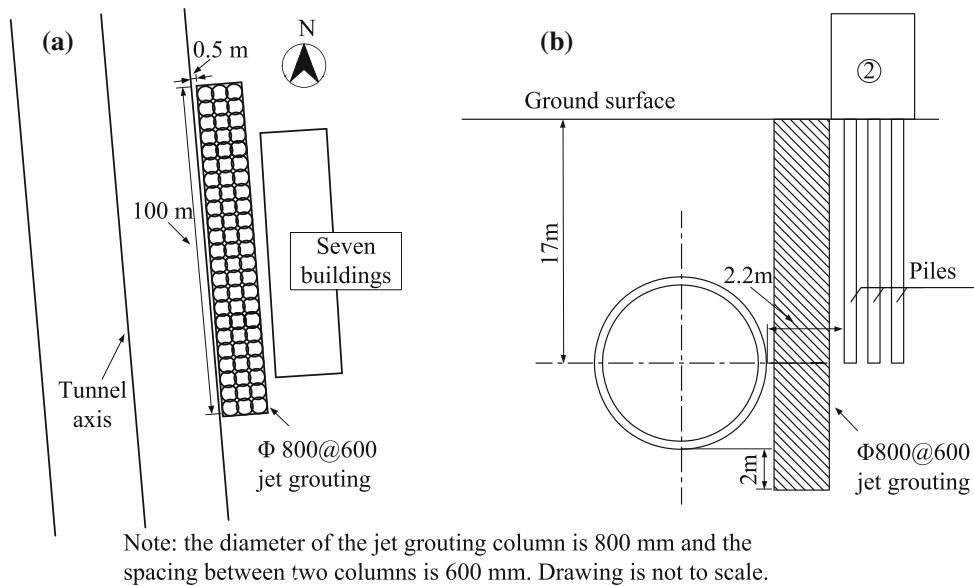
a Plan and b sectional view (A–A) of tunnel and building foundations
